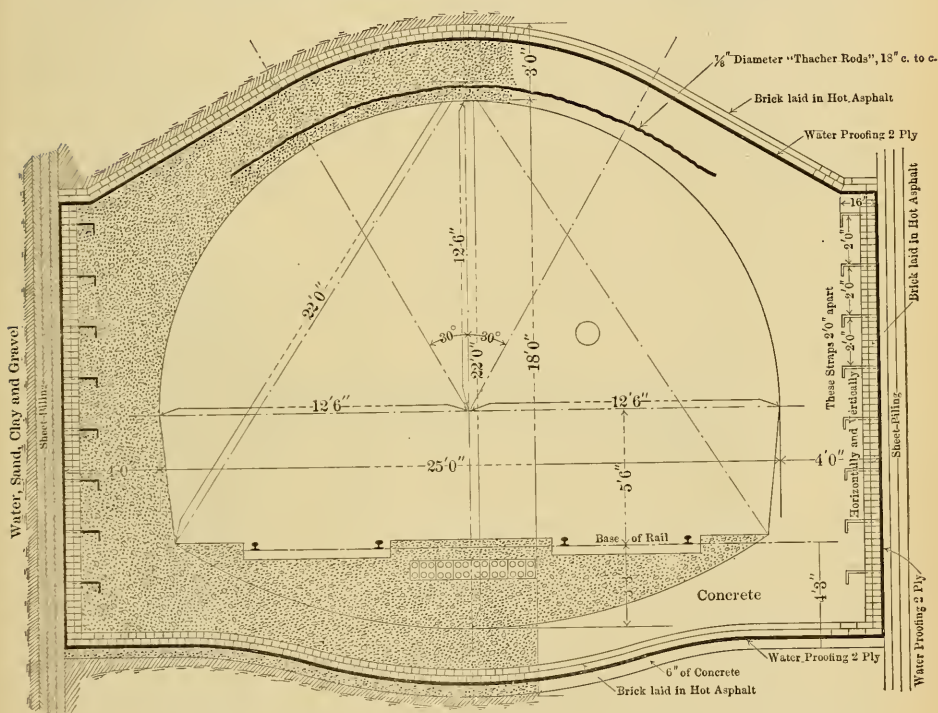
TYPICAL SECTION OF CONCRETE ARCH, EAST APPROACH TO HARLEM RIVER TUNNEL.
